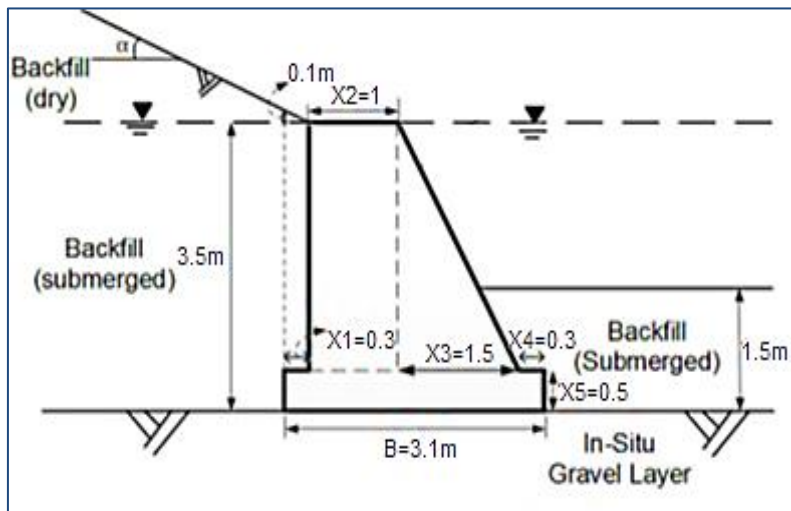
Cross section of the flood wall of Chiuliao First gravity-type [8]
